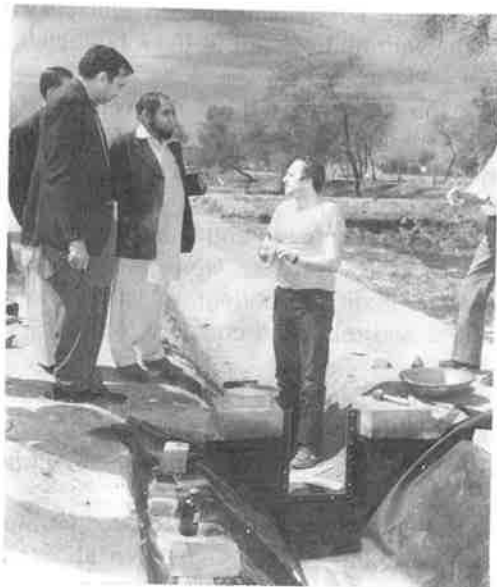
Taurus rubber sheet and Butyl adhesive strips joined with concrete pillars at Niaz Beg Research Station, Lahore.
